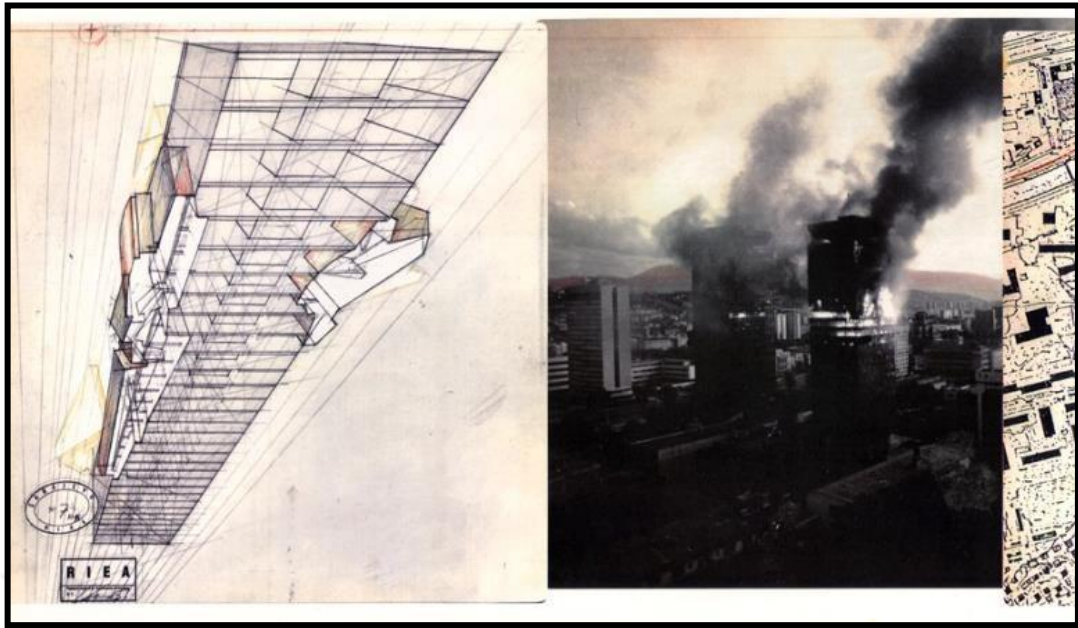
Below Left, the Bosnia and Herzegovina Parliament, which Can Yet be Saved Despite Being Severely Damaged, and the Blazing Electrical Management Building, Right (Woods, 2011).
